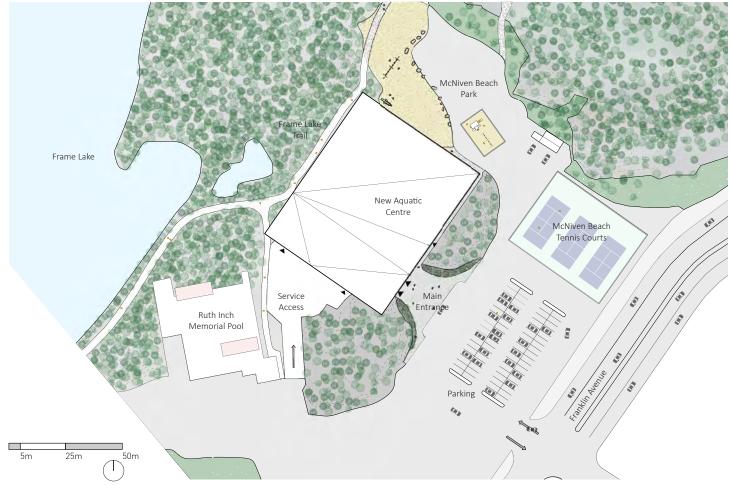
New Aquatics Centre Concept Design - 52m lane pool Site Plan
